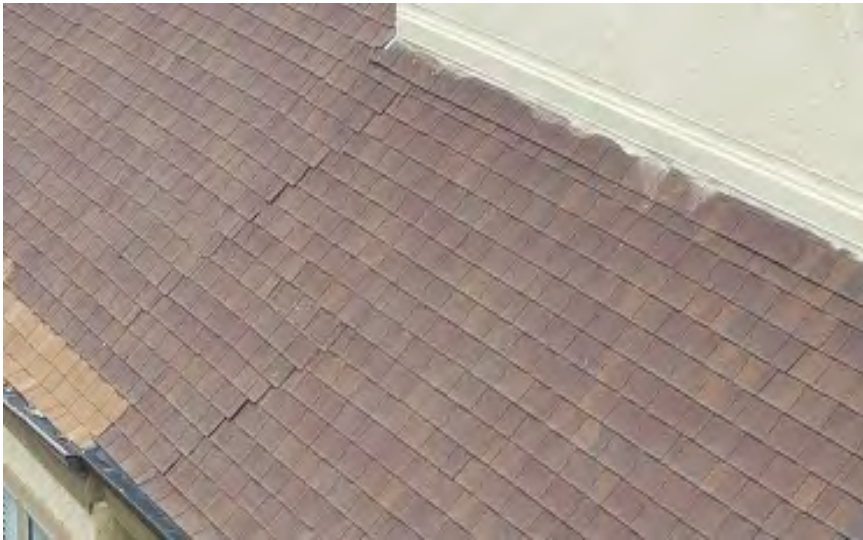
3<sup>rd</sup> Floor Deteriorated Walkway Canopy Façade between North and East Buildings
